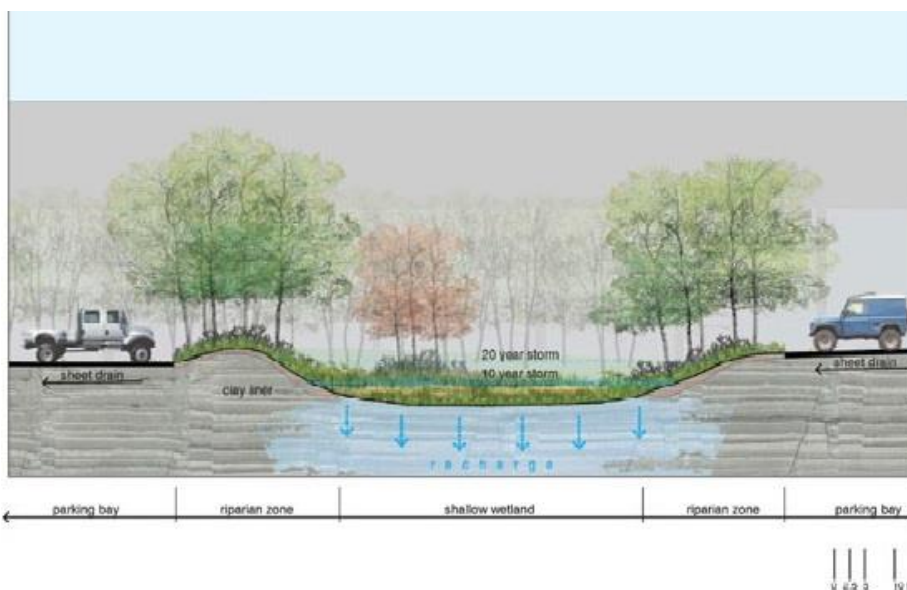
Detail section of retention basin and constructed wetland (Url-4).
